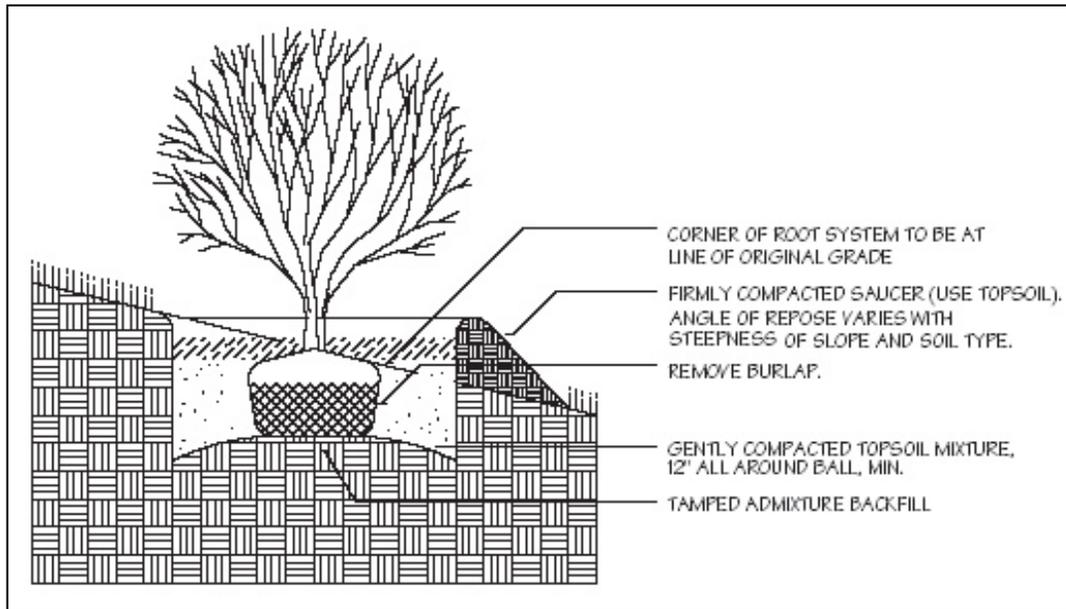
Ball and Burlap Shrub Planting Detail
